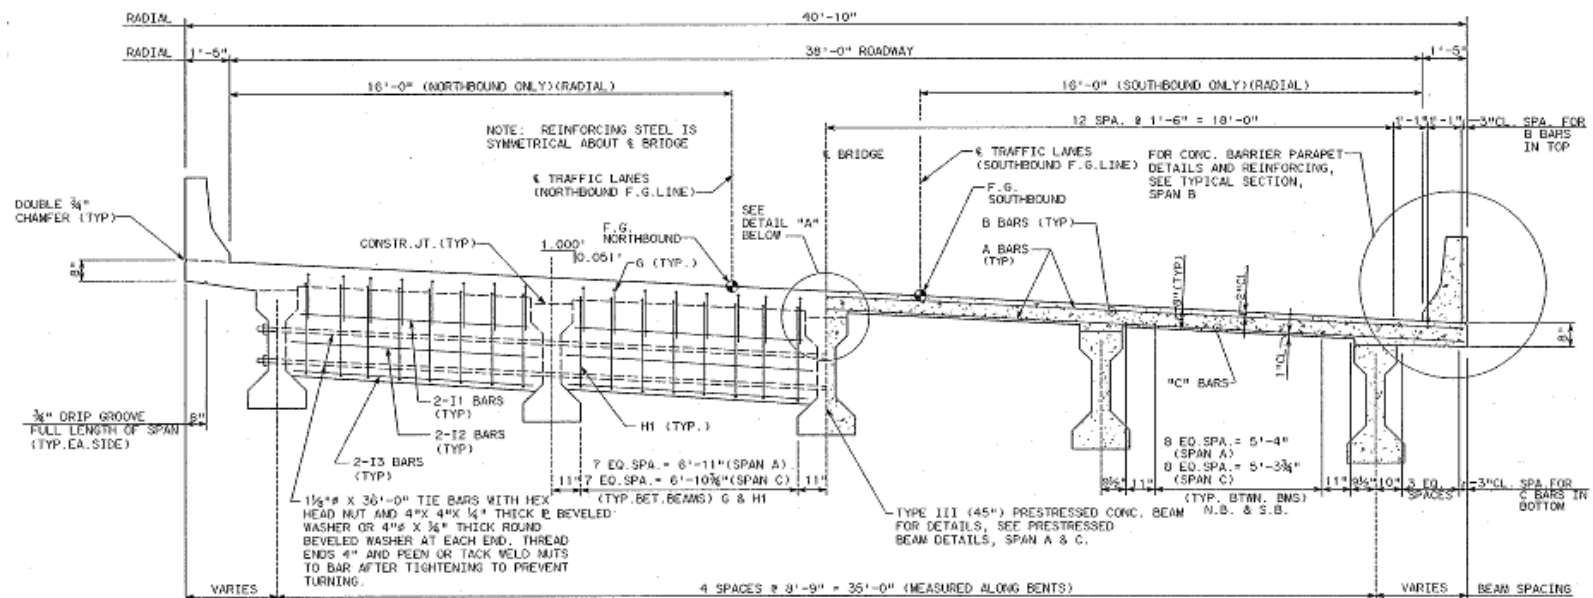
Cross-Sectional View of Archetype 2 Bridge (Barrett 2011).
